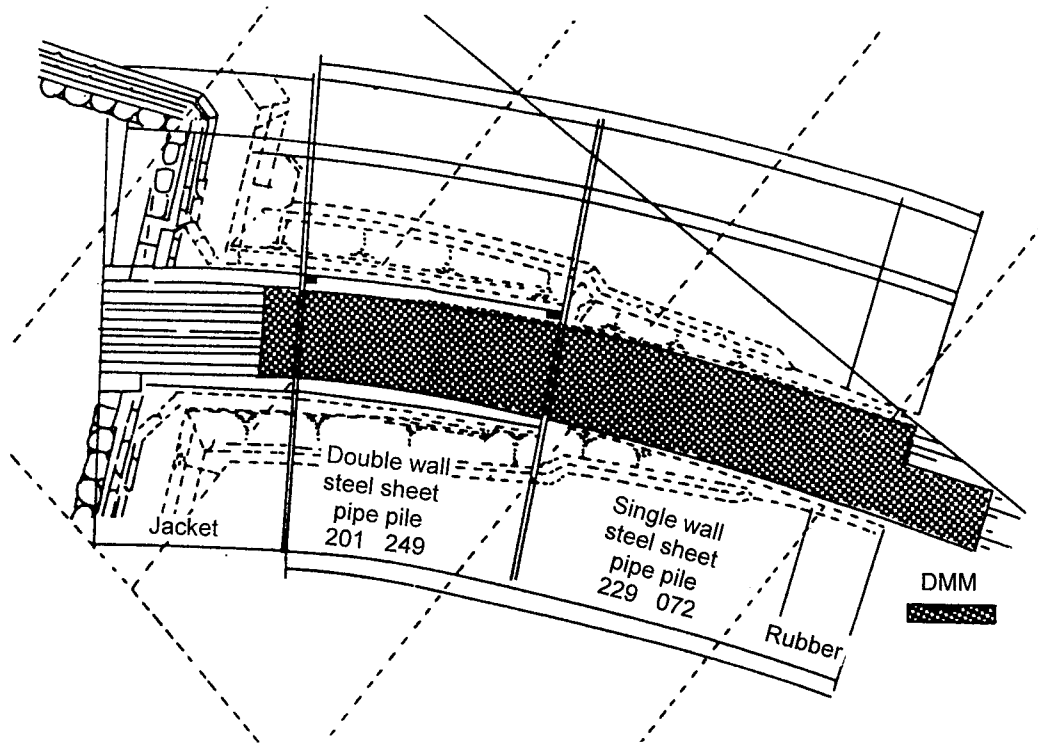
Plan of DMM execution area (Unami and Shima, 1996).
